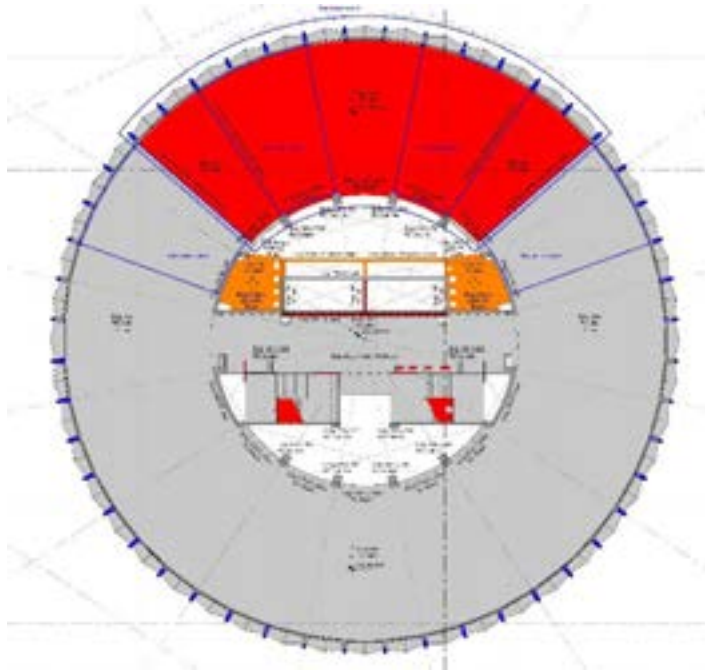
Back propping & Openings on 15th Floor within the Tower
